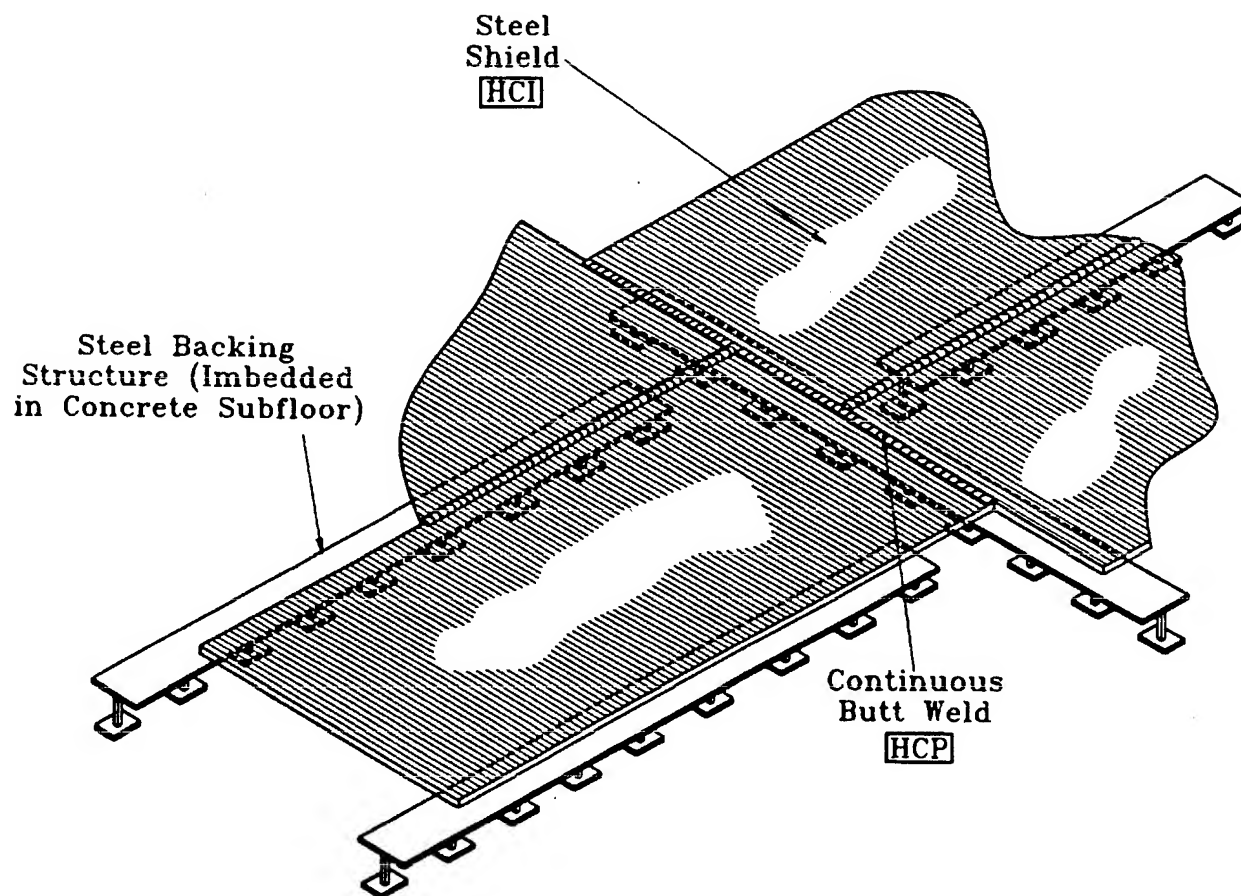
Butt-welded shield seam with steel backing.
